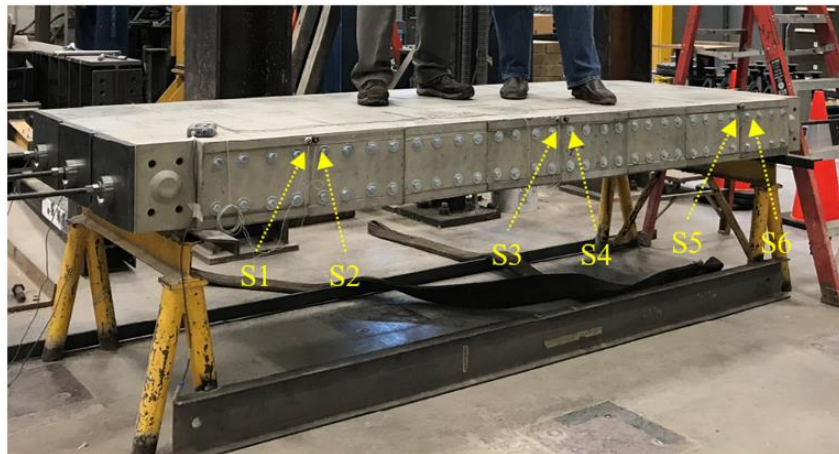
Footbridge assembled with concrete blocks extracted from (Bao and Li, 2020)
